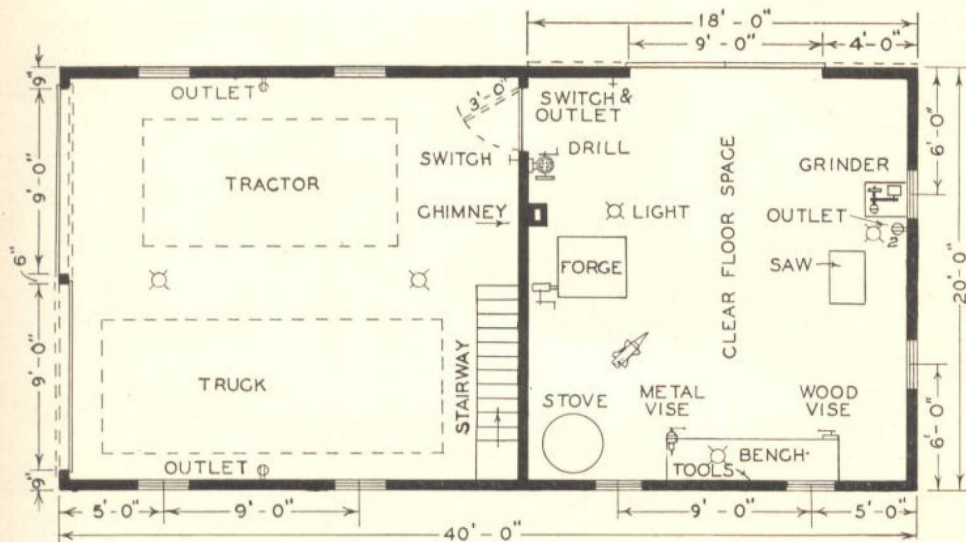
Floor plan of shop in end of large garage, with space for car in shop, and truck and tractor in other room.
